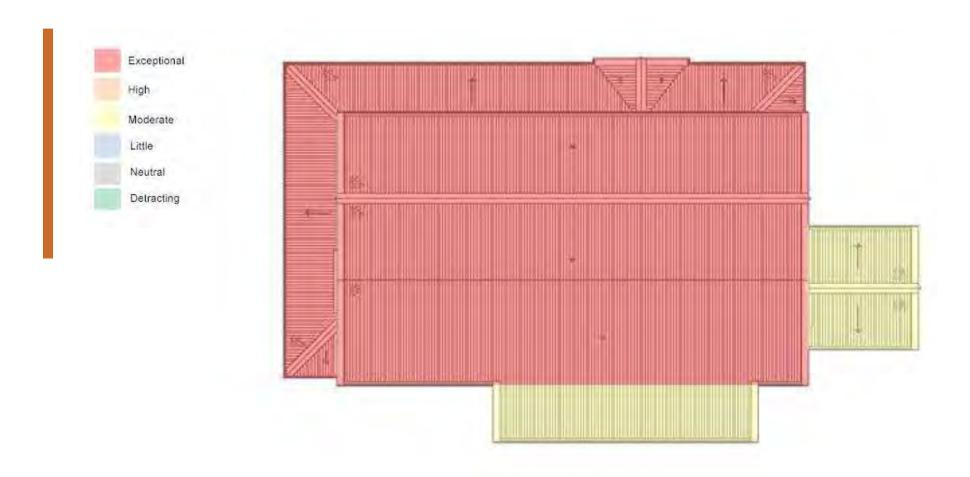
Significance ranking for the roof of the cottage. (Source: Curran, existing roof plan, A101, revision A, 2 June 2017)
